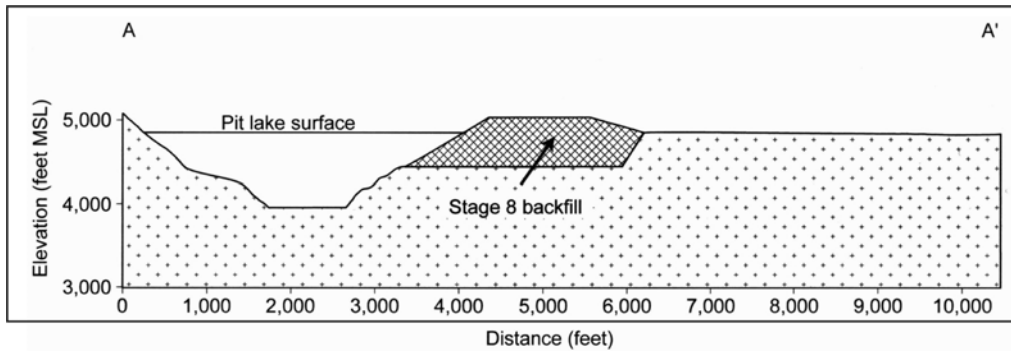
Stage 8 Cross Section A to A' through Pipeline/South Pipeline Open Pit
